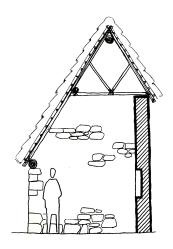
Drawing of roof slopes and lengths by Gasparini & Margolies
